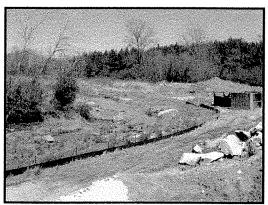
Crossing between SR1 and SR2 Looking upstream
